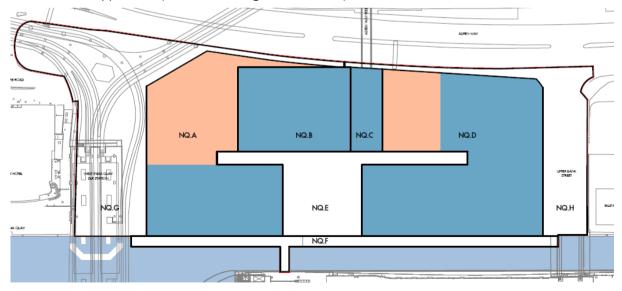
Land Uses – Ground, Mezzanine & First Floor Parameter Plan
